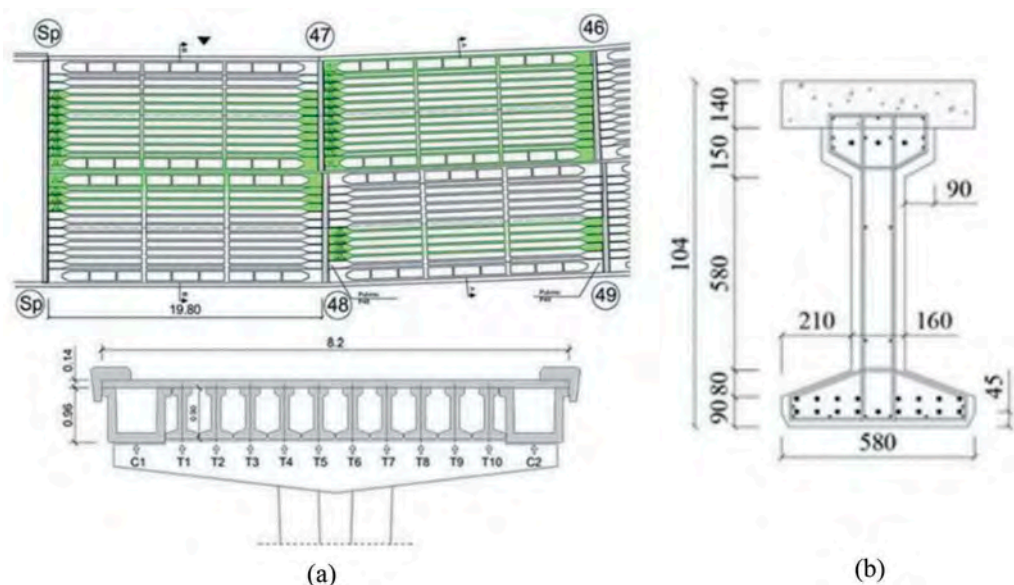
(a) Drawing of the first four decks of the southern part of the viaduct. In green, the beams collected. (b) The I-shaped beam cross section (measures in mm).
